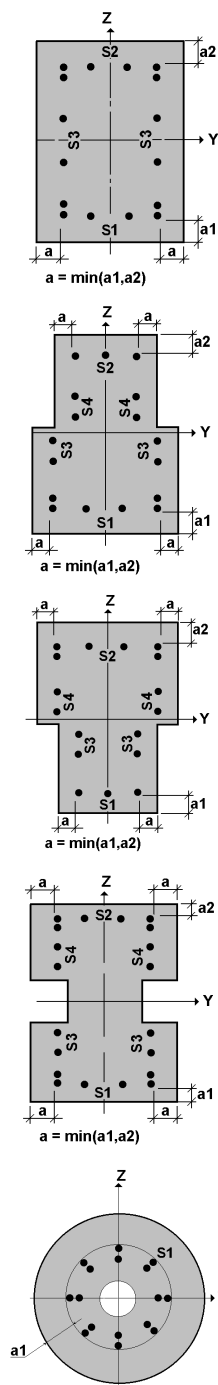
Arrangements of longitudinal reinforcement
